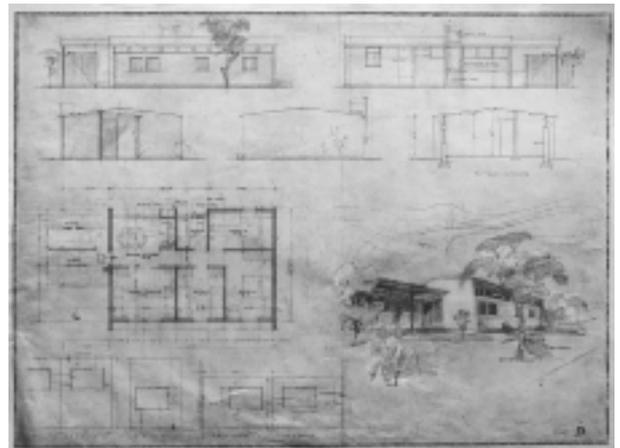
Stauch’s winning entry for African housing submitted to the Institute of South African Architects, 1953 (Stauch Family Collection, Pretoria).
